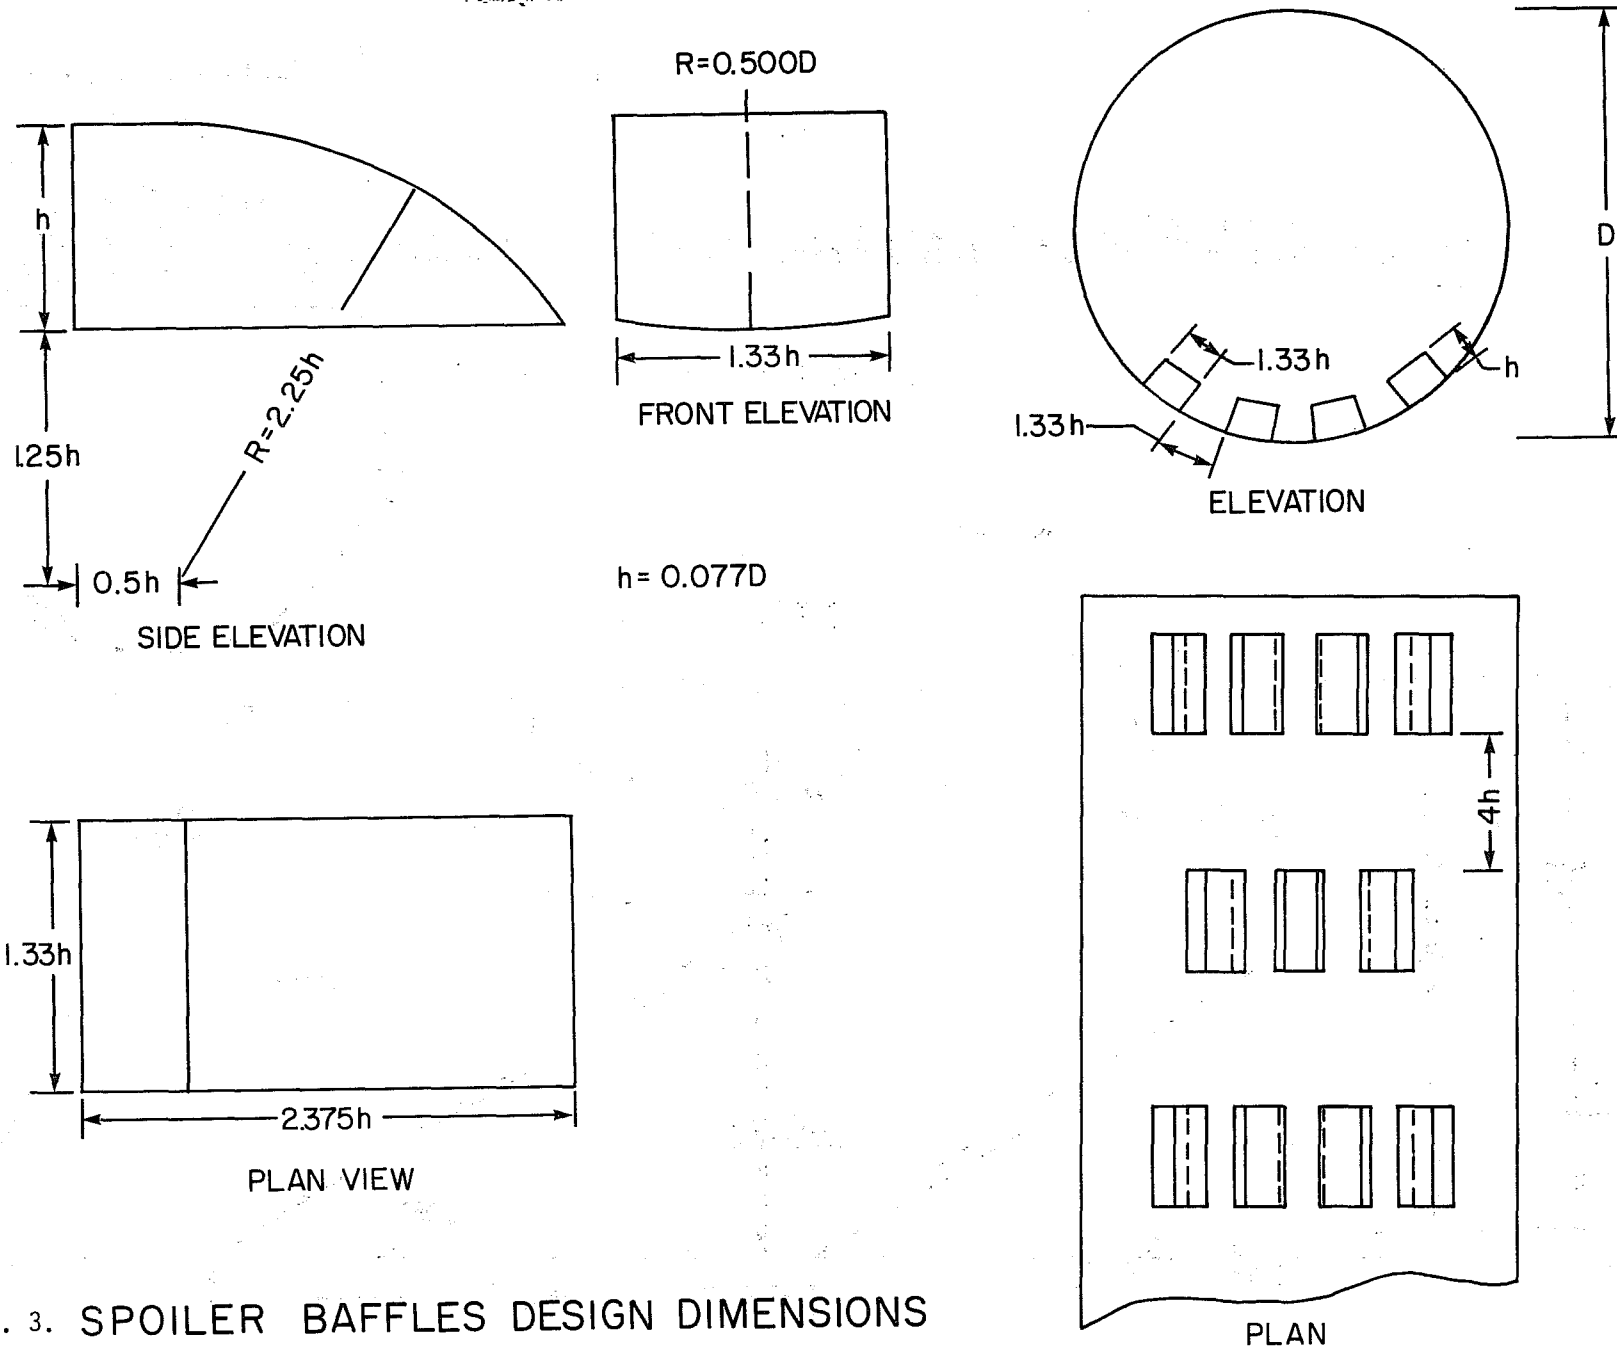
SPOILER BAFFLES DESIGN DIMENSIONS
